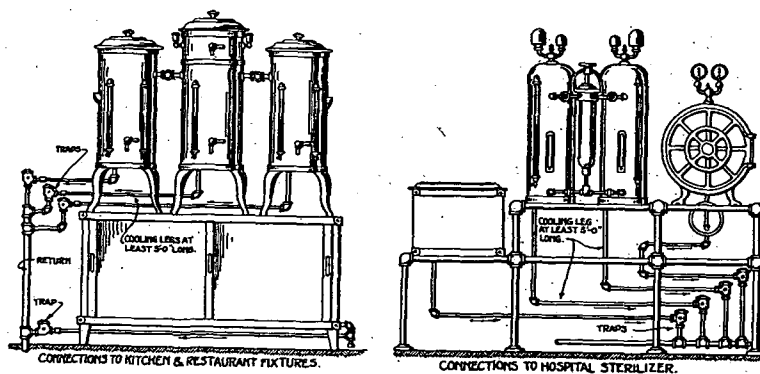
TYPICAL CONNECTIONS TO KITCHEN AND HOSPITAL EQUIPMENT
